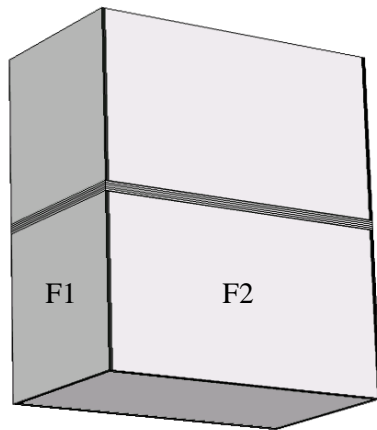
Calculation model of two vertical rooms based on the finite element method; F1: flanking wall 1; F2: flanking wall 2
